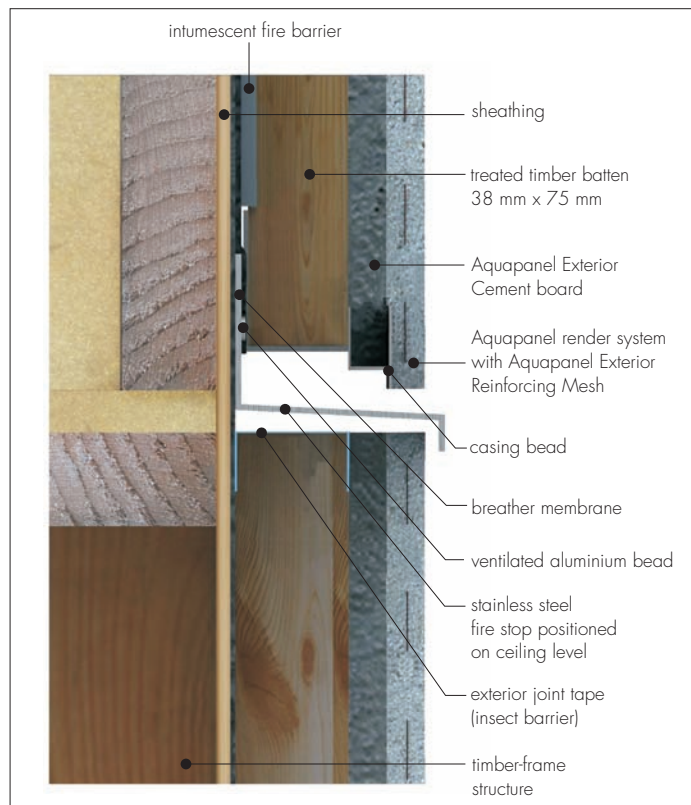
Fire stop detail specific up to four-storey, timber-frame construction
